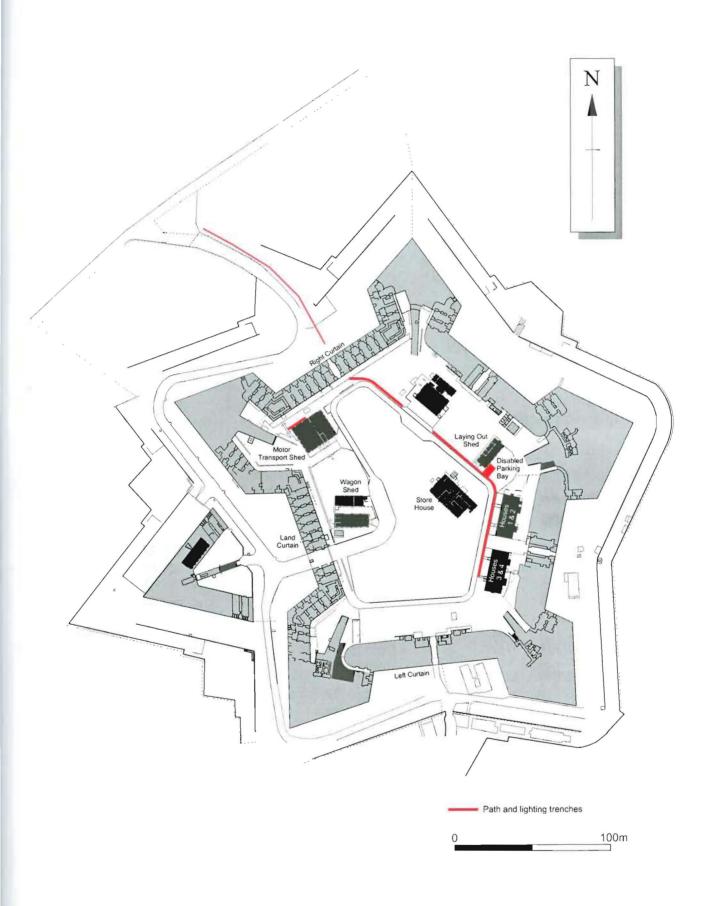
Plan of Fort Cumberland showing the location of the Path and Lighting Trenches
